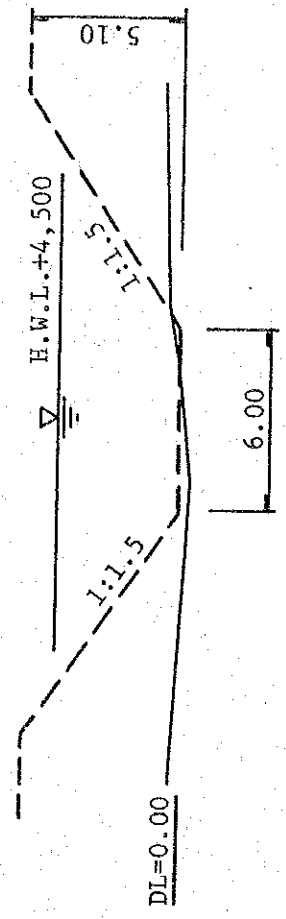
TYPICAL DESIGN OF KHAL IMPROVEMENT (3)
